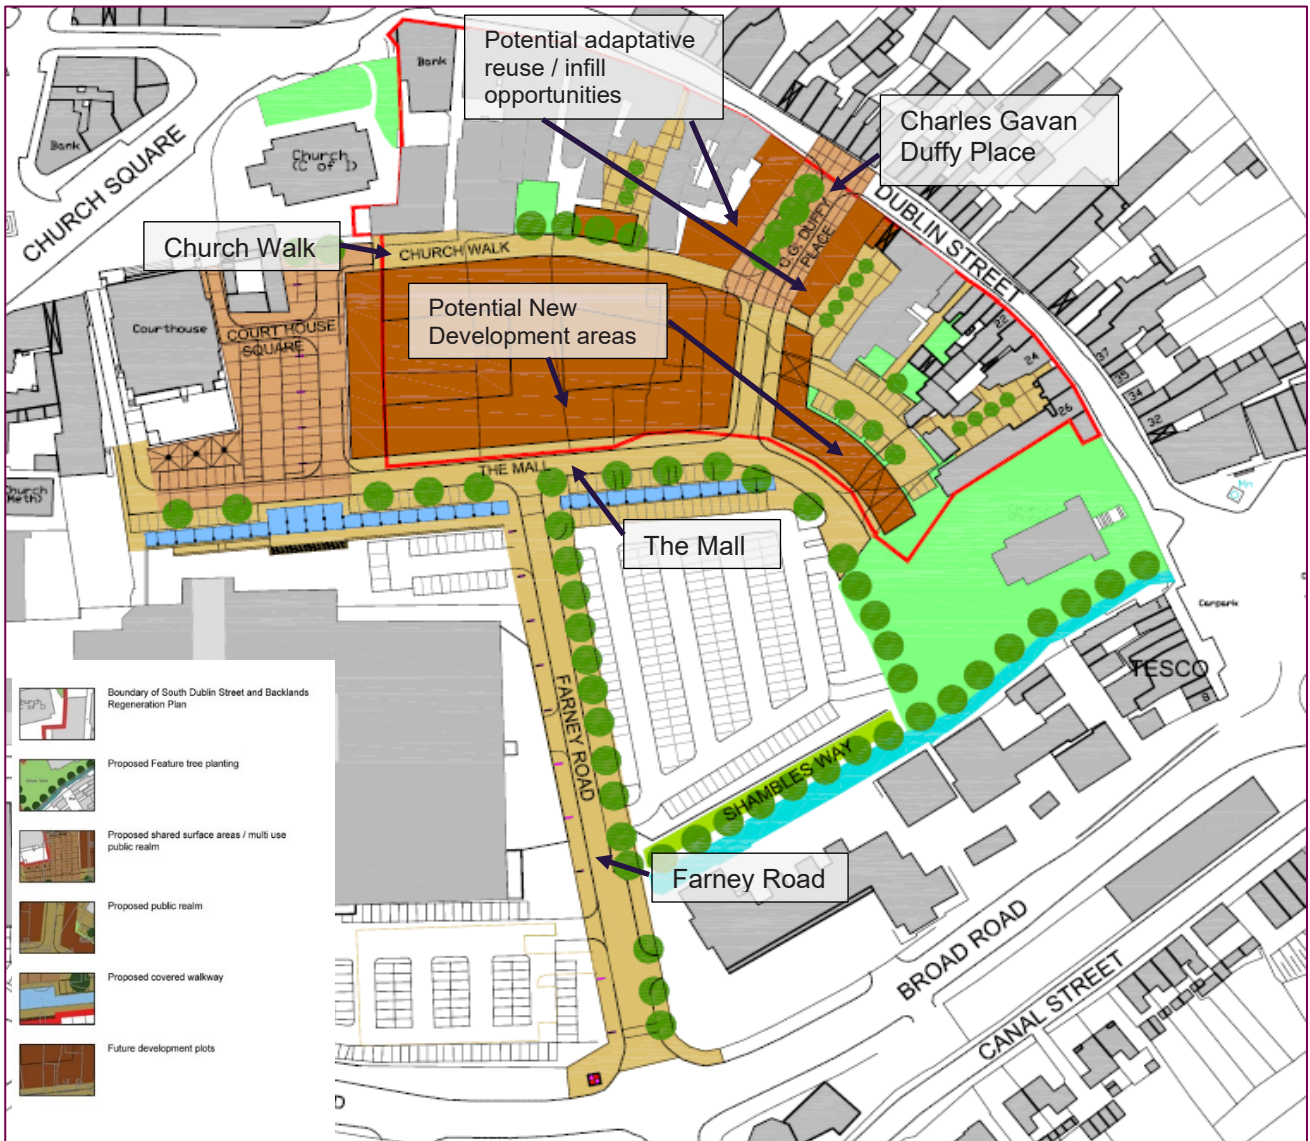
Dublin Street Regeneration Plan - Design Concept
